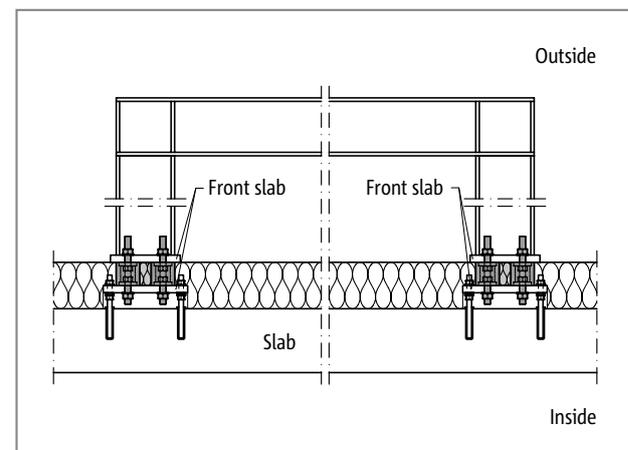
Schöck Isokorb® T type S-V: Rigid frame connection for secondary structures (additional moments from imperfections must be taken into account)
